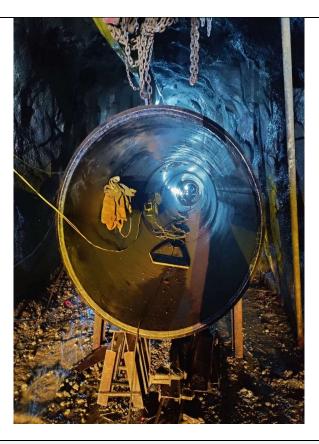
Pipe Erection work at Inclined Penstock Tunnel
